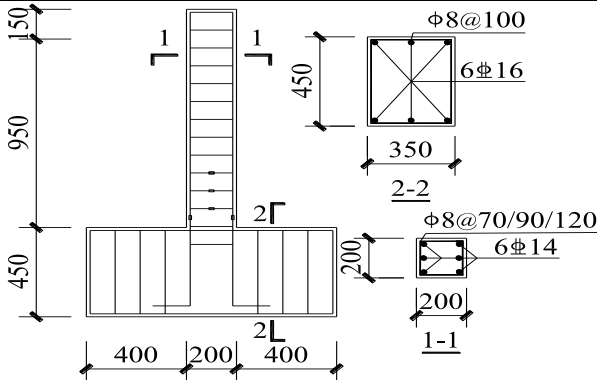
Dimensions and Reinforcement Arrangement of the Test Specimen
